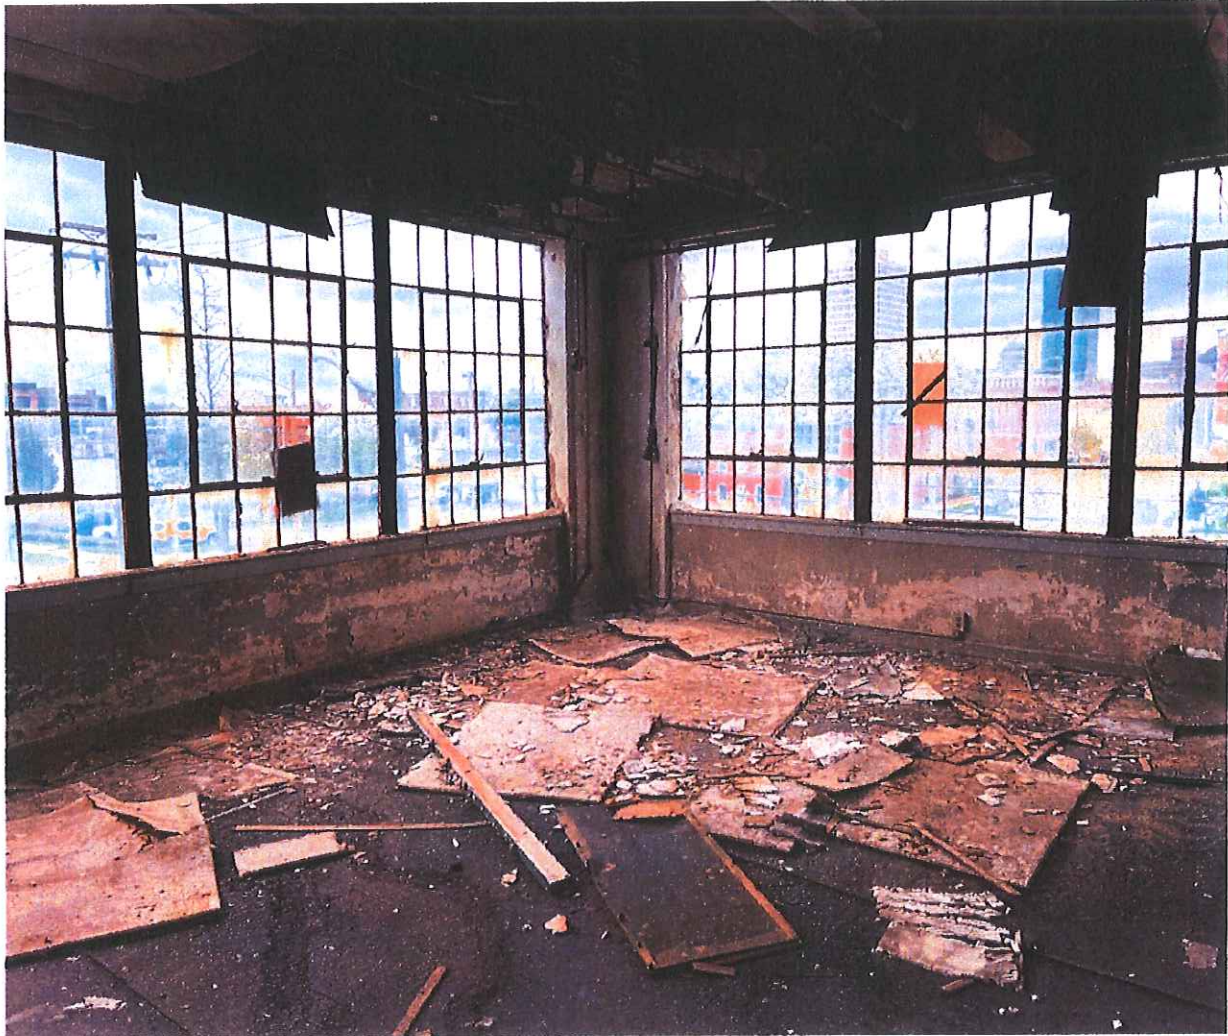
Second floor, office space looking southeast towards Adams Street and 13<sup>th</sup> Street corner.
